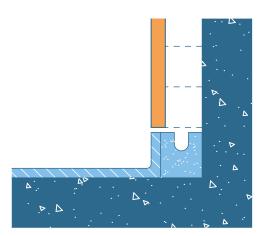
Drainage channel in areas of water ingress, concealed behind wall finishes, but easily accessed
